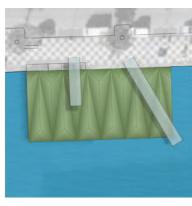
Plan of design Wijnhaven (1.300) (left)
